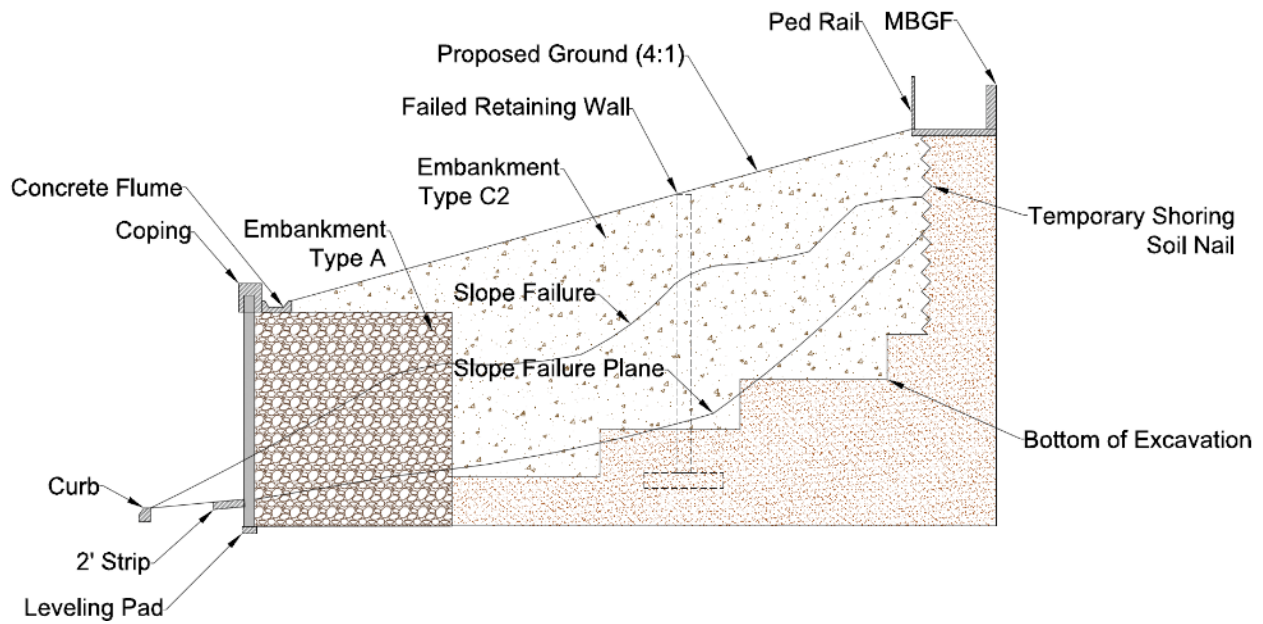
Slope repair using temporary shoring, soil nails, benching, concrete retaining wall, and water management
